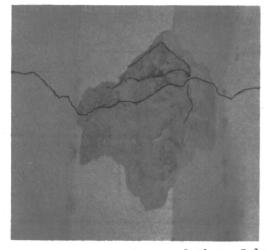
Crushing of Ground Floor Column in the Eastern Site Building
